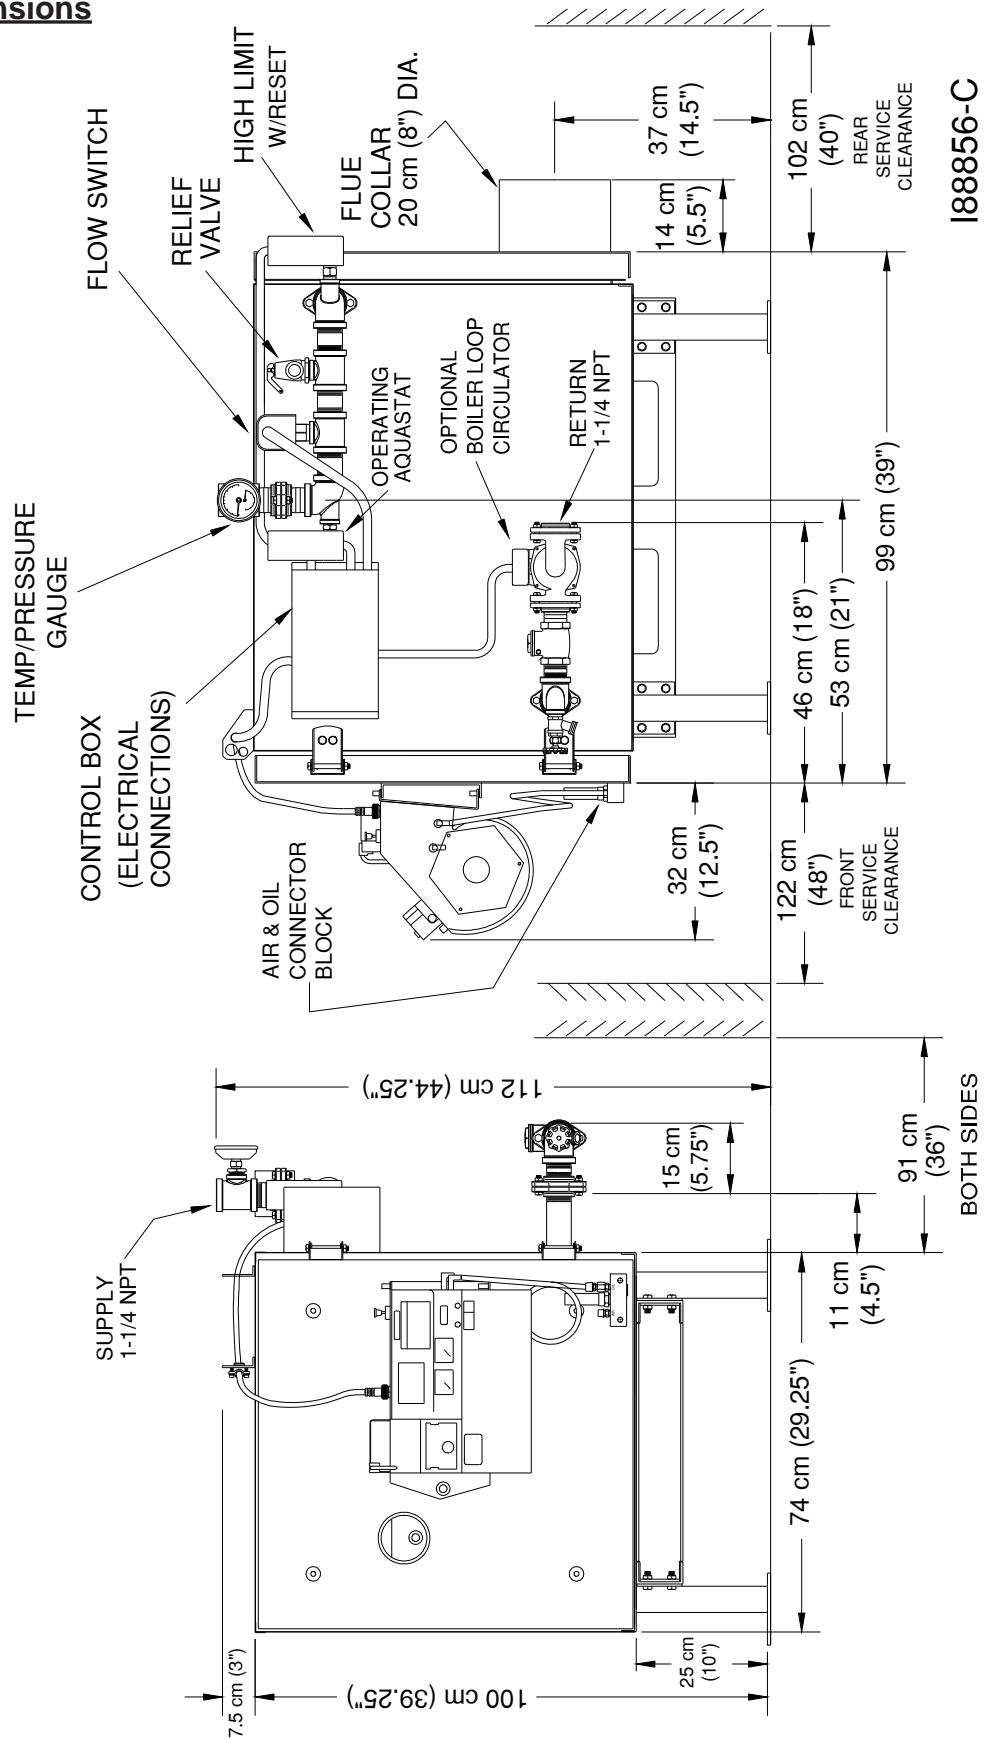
Model CB-200-CTB Dimensions (Single Boiler)
